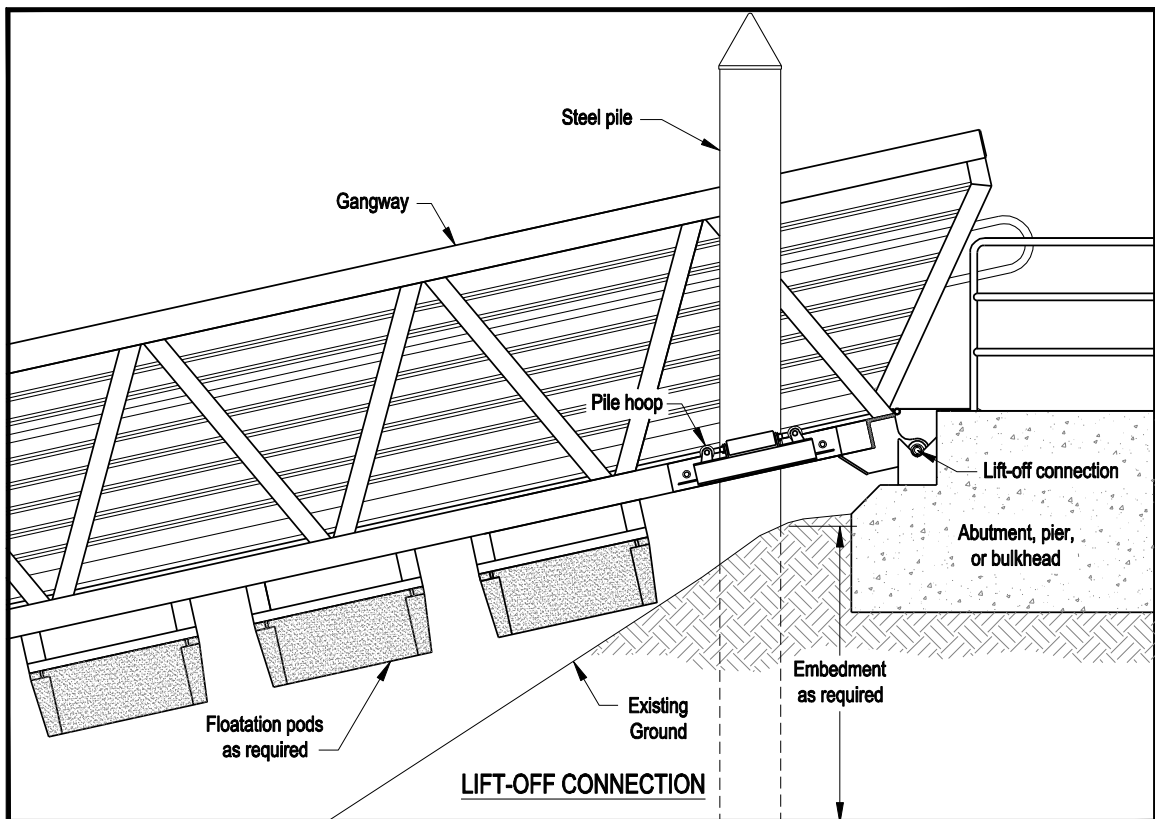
Required lift-off connection when water levels may exceed connection point elevation
